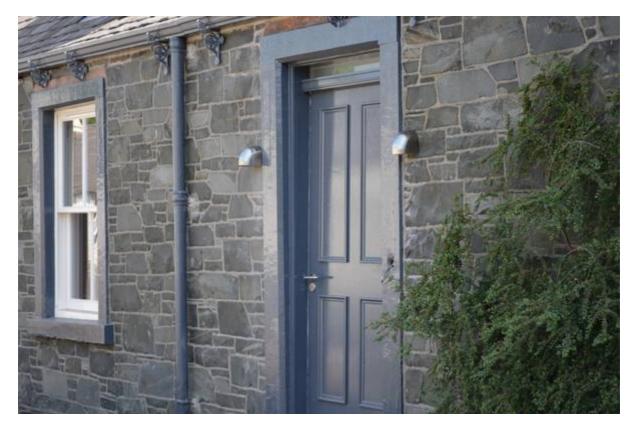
Example of new door lights installed during house renovation in Holm Street
